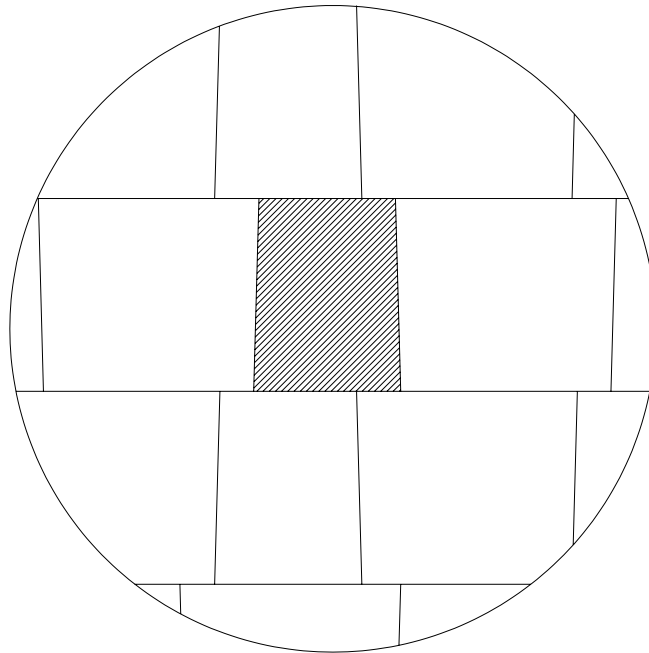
Drawing of TAS 107 Test Specimen Showing the Layout of the Architectural Shingles and the Location of the Instrumented Section.
